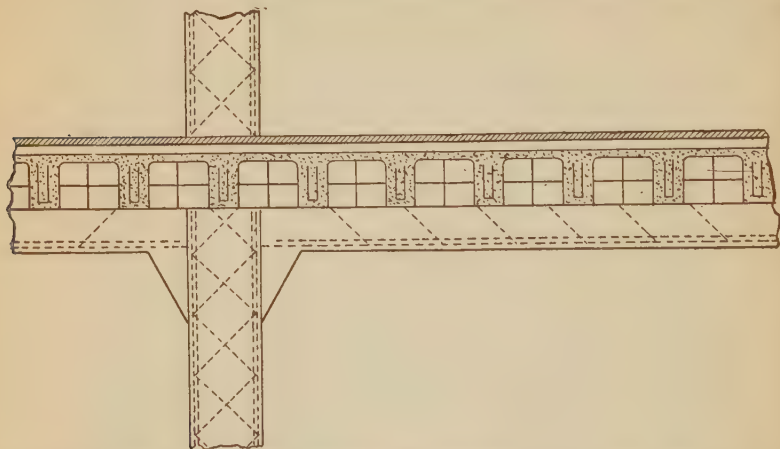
,077.—Combination tile and reinforced concrete system. *In erection*, a flat centering is used which, however, need not even be continuous. Planks a few inches wider than the concrete beams are placed under the spaces to be filled by the beams and the tiles are laid in rows and supported along their edges by the planks, thus forming the sides of the moulds for the beams. The reinforcement is placed and the concrete poured with or without floor plates, as the necessities of the case may require. Care must be taken in pouring the concrete that the tiles are not displaced sidewise. The tiles should fit closely at their joints, otherwise the finer particles of the concrete are liable to flow into them, either making the concrete porous or requiring more concrete than is necessary.
